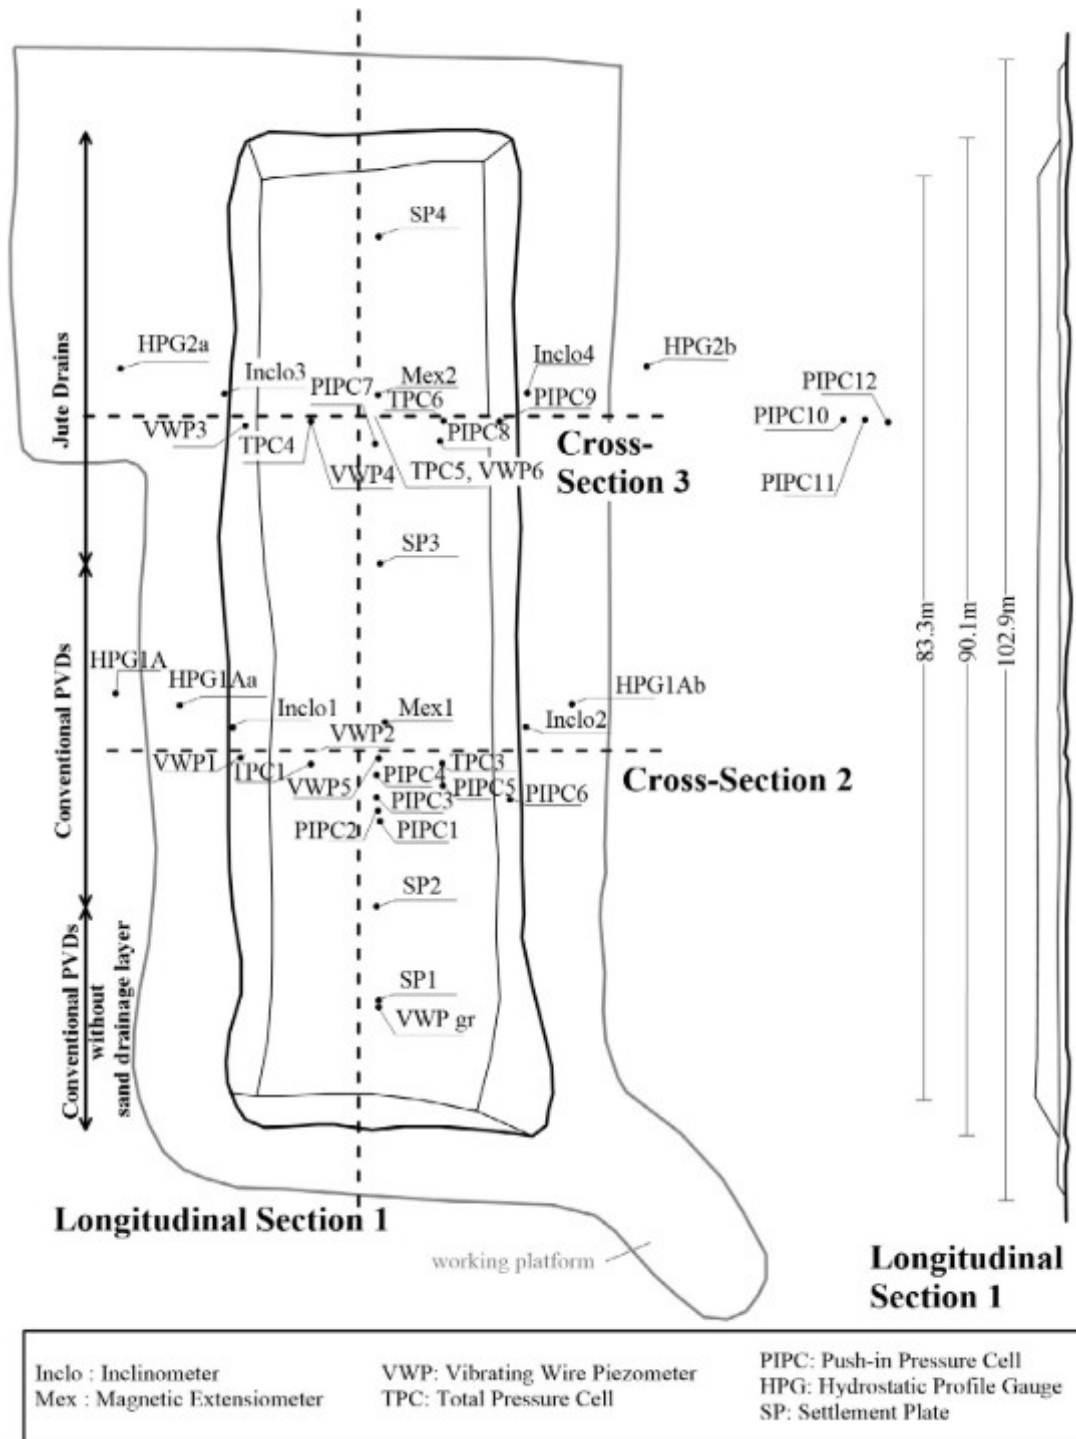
Ballina Test Embankment Plan and Elevation, from Kelly et al. (2018)
